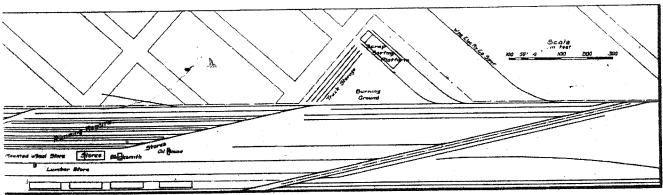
Section 2.—Layout of C.N.R. Fort Rouge Shops—South End.
